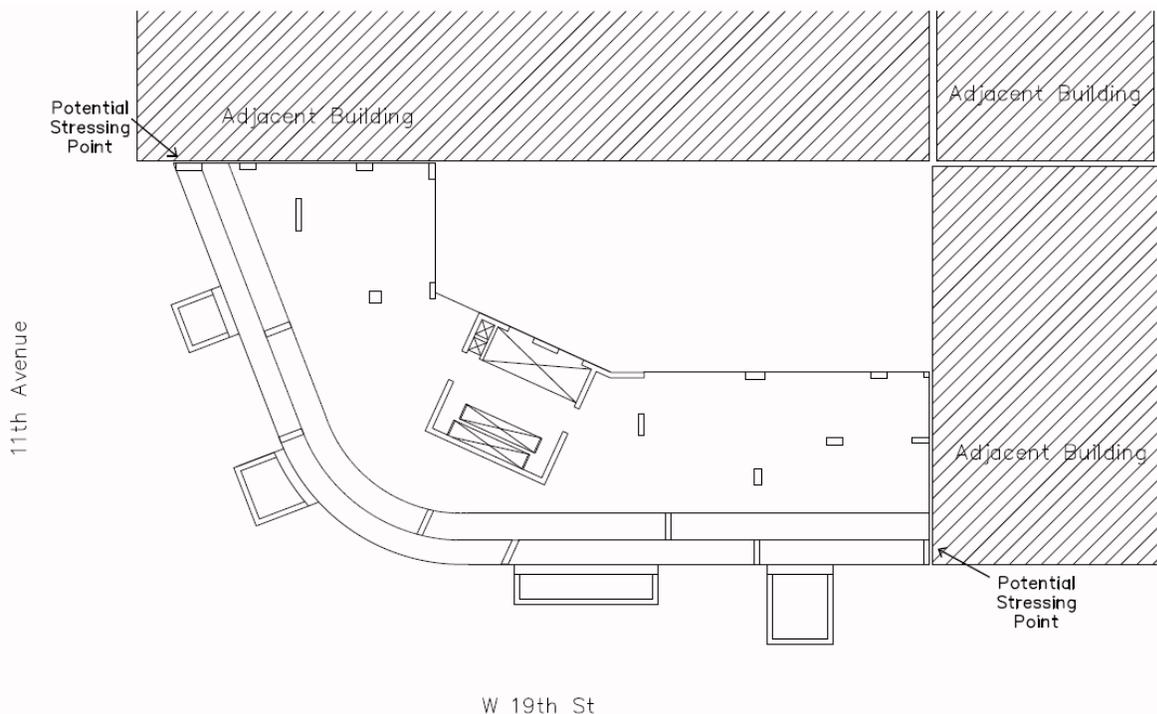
6th Floor Plan Showing Neighboring Buildings and Potential Stressing Locations
